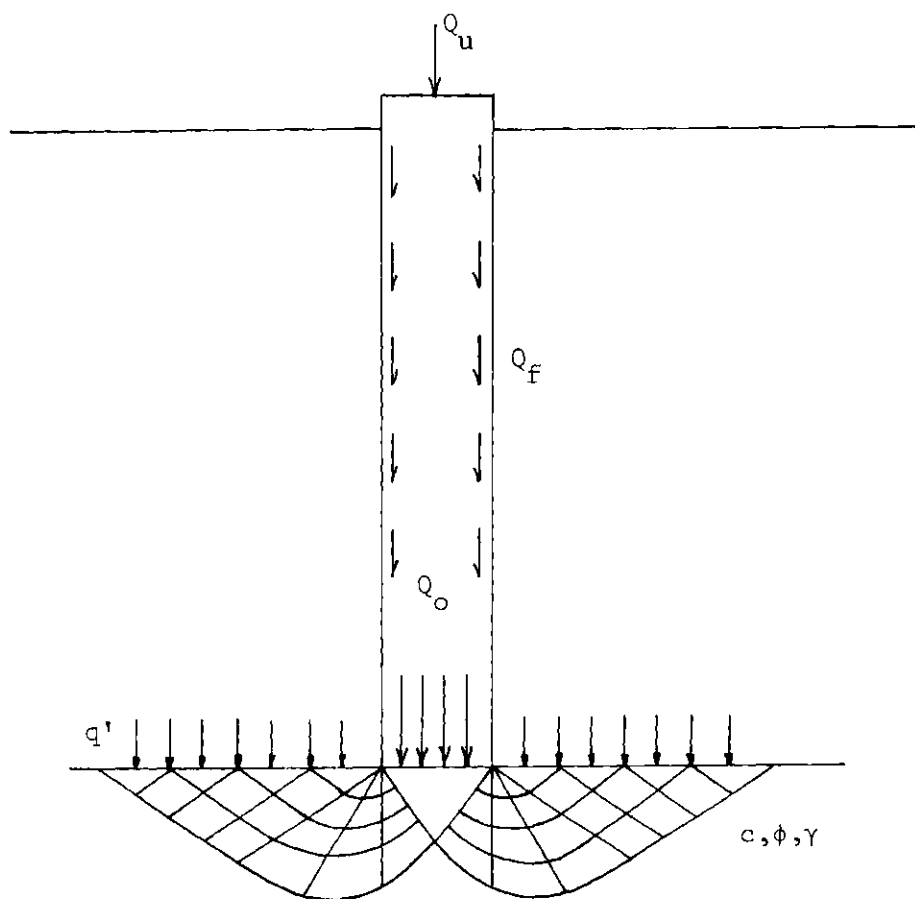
Terzaghi's Assumed Failure Pattern Under a Deep Foundation (2)
